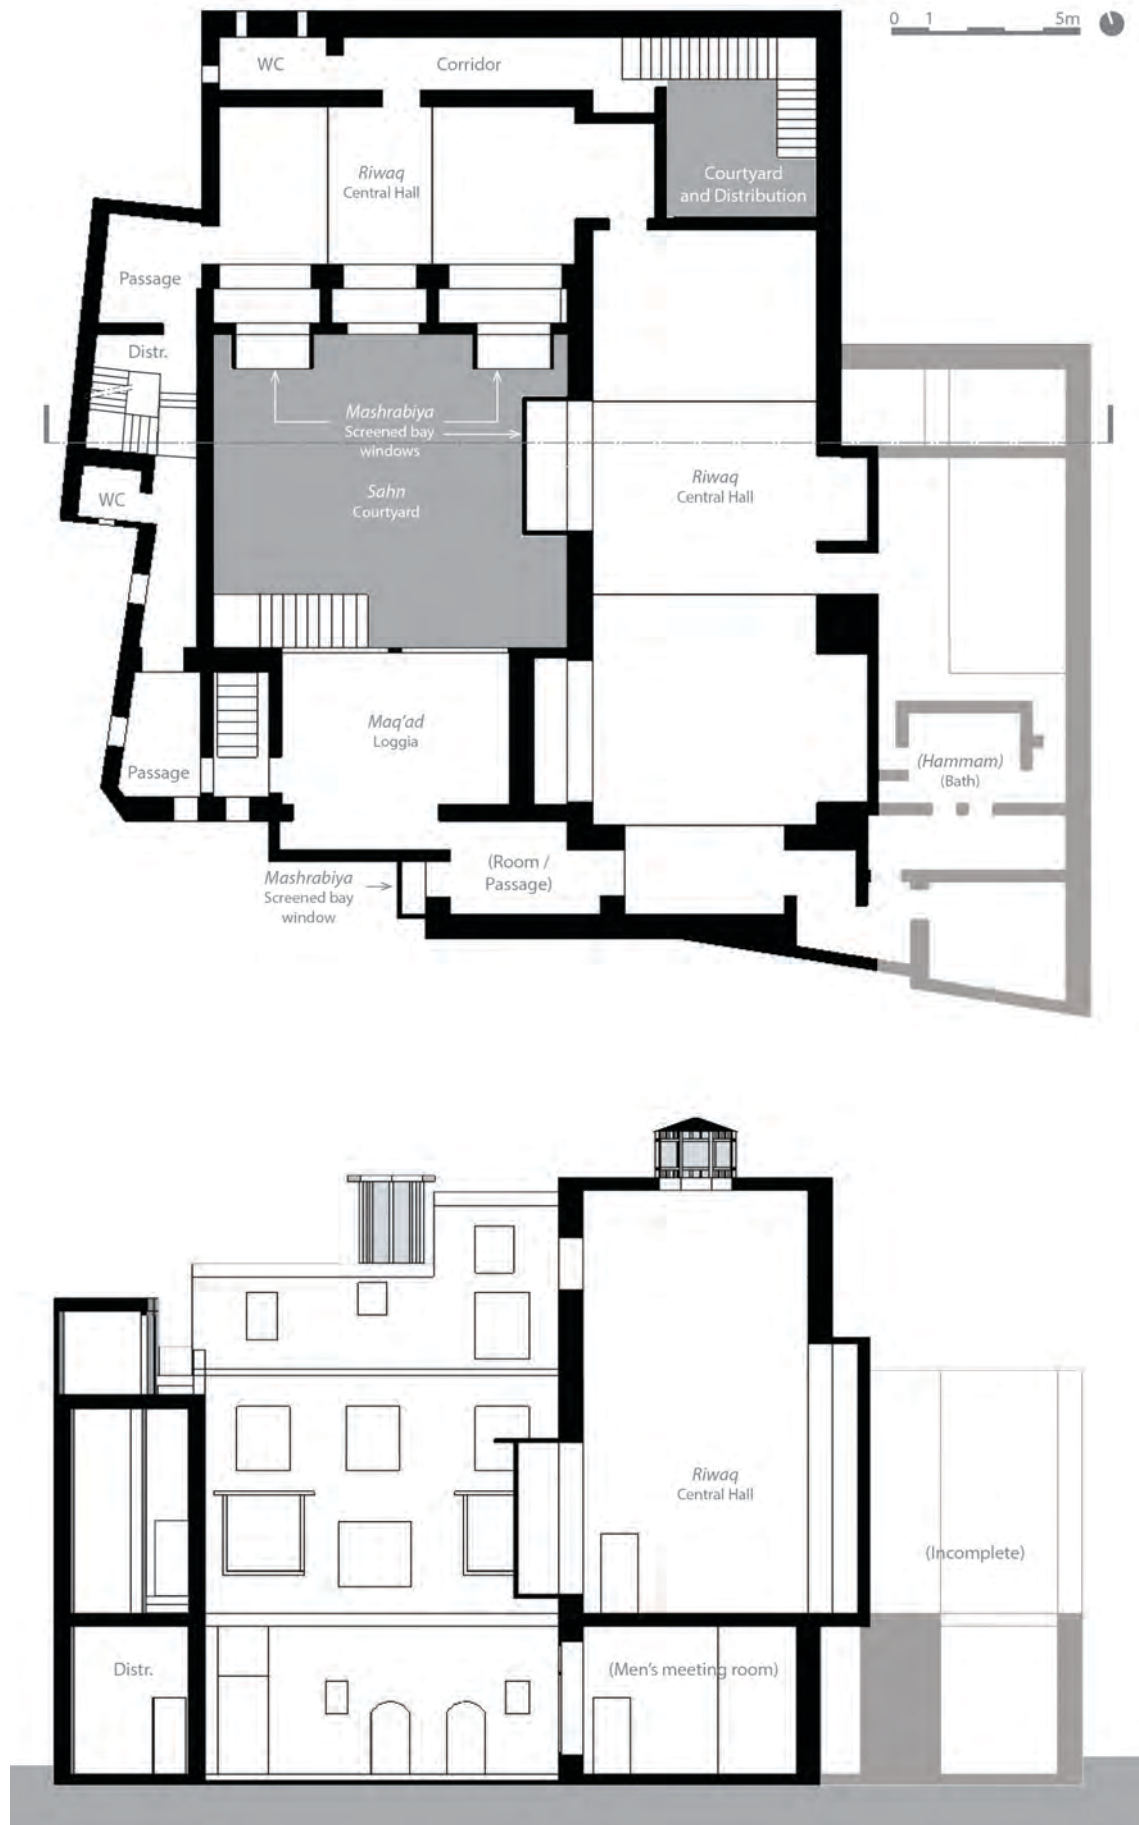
Manzil Zaynab Khatun – First floor and section West-East.
